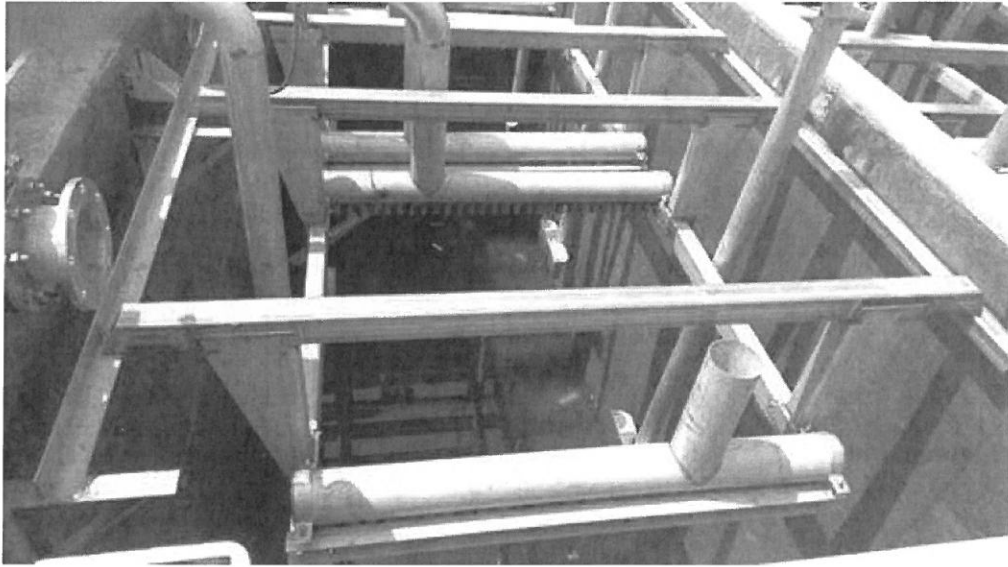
Cassette hanging supports in position before full cassettes are assembled and installed.
